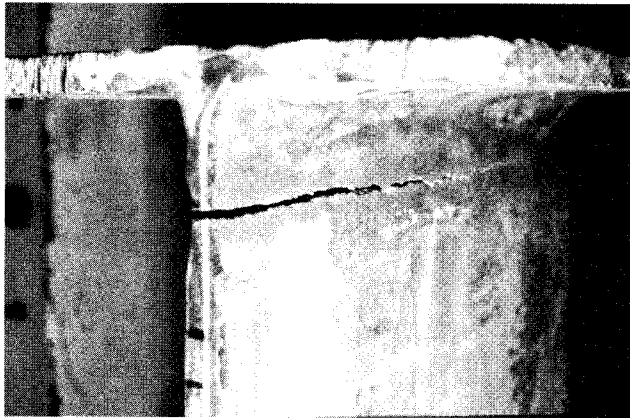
Specimen SW-I after Testing (Upside Down) Showing Final Crack Length and Opening
